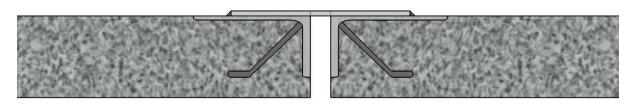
Section cut slab-slab welded connection, side view
